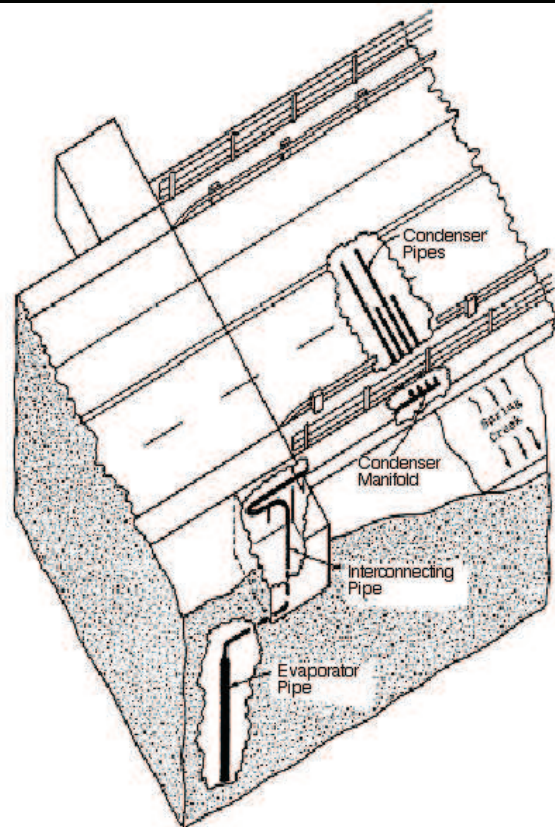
Geothermal heating of roads and pavements (Lund, 1986)
